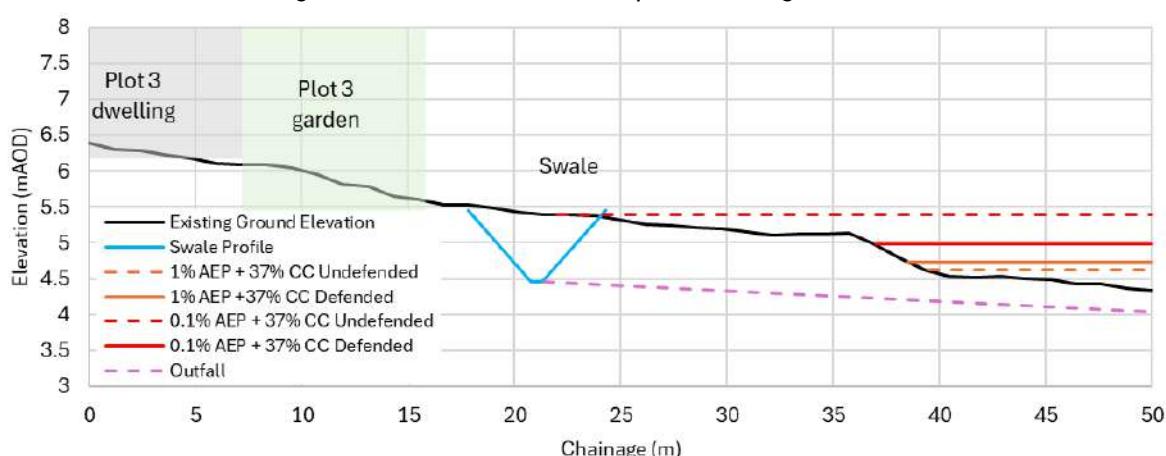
shows a cross-section profiles through the swale and towards the outfall drain (which has an invert of 2.4m aOD). This demonstrates that the proposed elevations for the swale will allow discharge to the drain. There is potential for the outfall to become surcharged due to fluvial flooding of the land to the north of the Site. An additional model run has been undertaken with a surcharged outfall at a level of 4.76m aOD which corresponds to the fluvial flood level for the 1% AEP with 35% CC (Central estimate). This run (see Appendix F) demonstrates that the surcharged outfall scenario results in flooding from the swale of 33.3m³. Flooding from the swale would spill into the field to the north, which would already be inundated due to the fluvial event. The additional volume spilling from the basin would be offset by a reduction in flow out of the outfall (which would otherwise also be contributing to the same hydrologically linked area of flooding). Conservatively assuming that the additional flood water (with no offset for a reduction in flow through the outflow) would spread out
